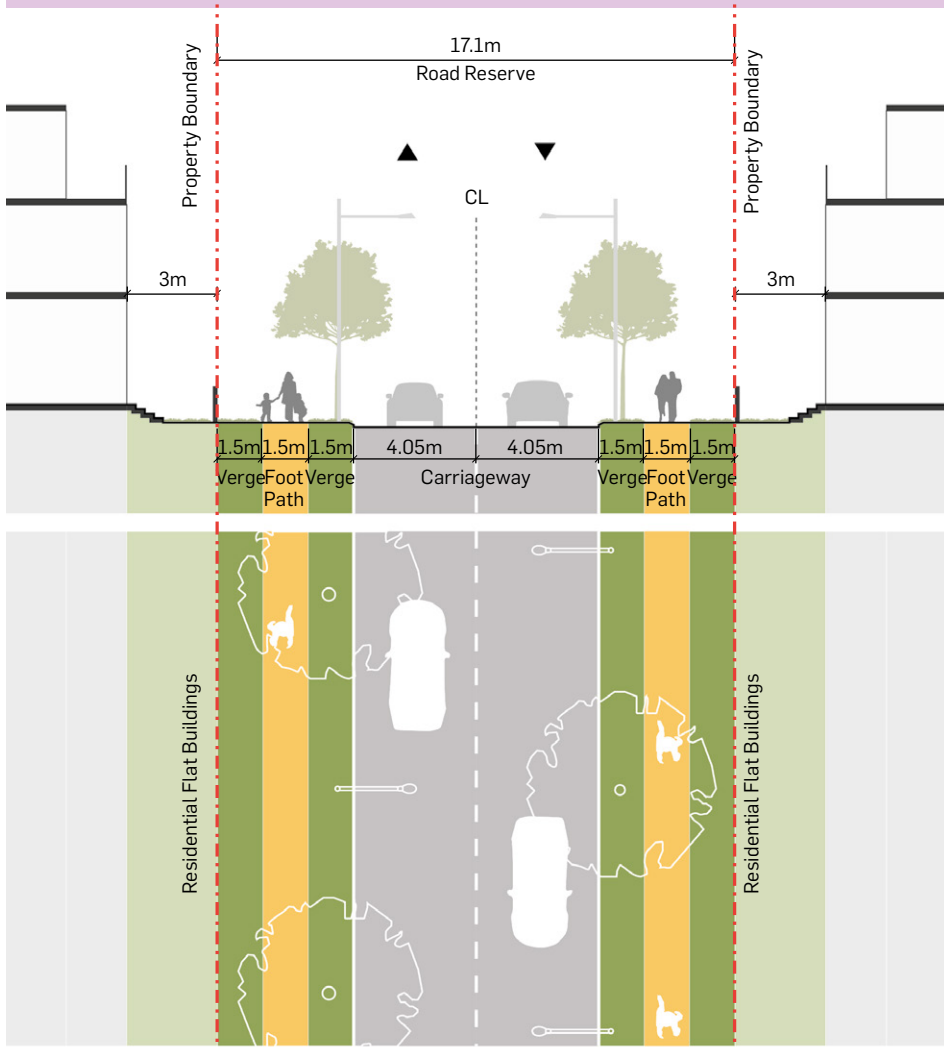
Indicative Street Section E-E' - Access Street - Type 6
